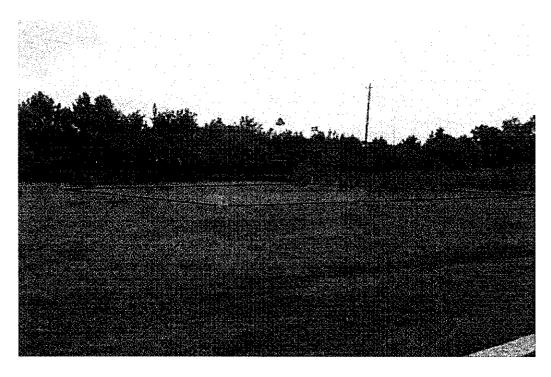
Phase I pre-construction – Headworks Building survey of excavation area.
